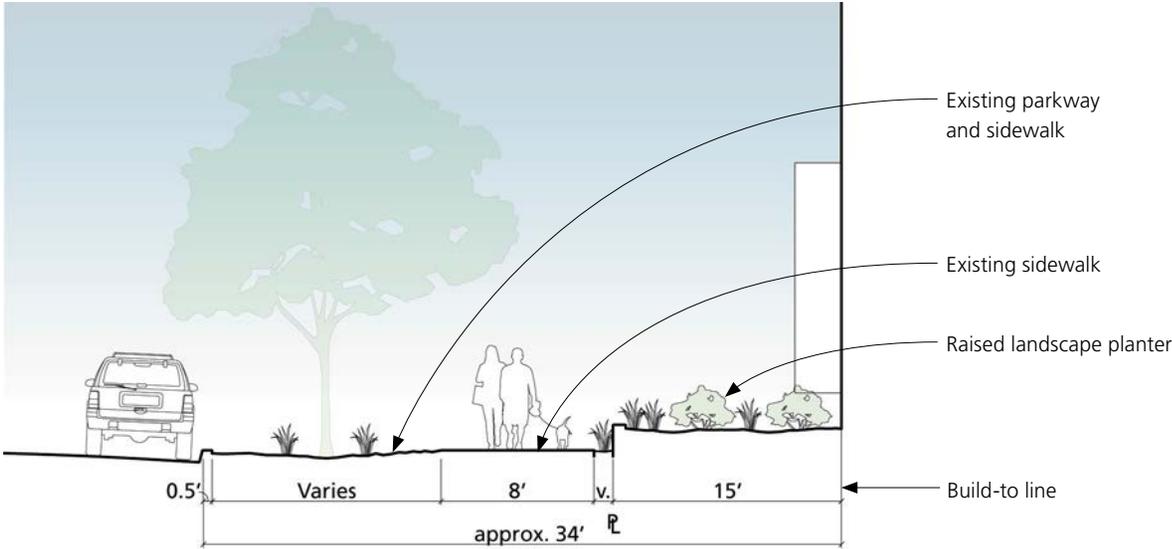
Sidewalk Section With Raised Landscape Planter
